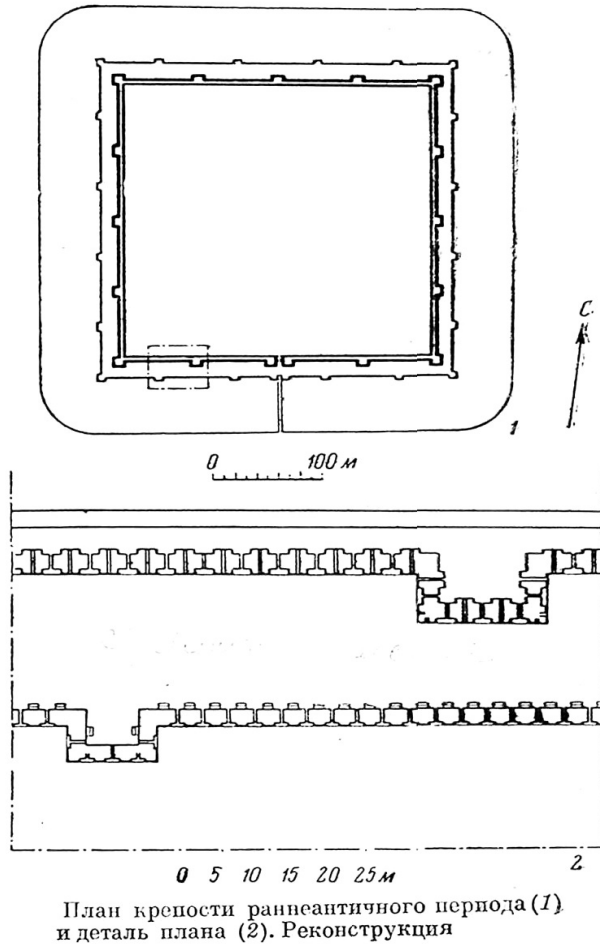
Fortress plan of early antiquity (1) and plan detail (2). Reconstruction. [6]
